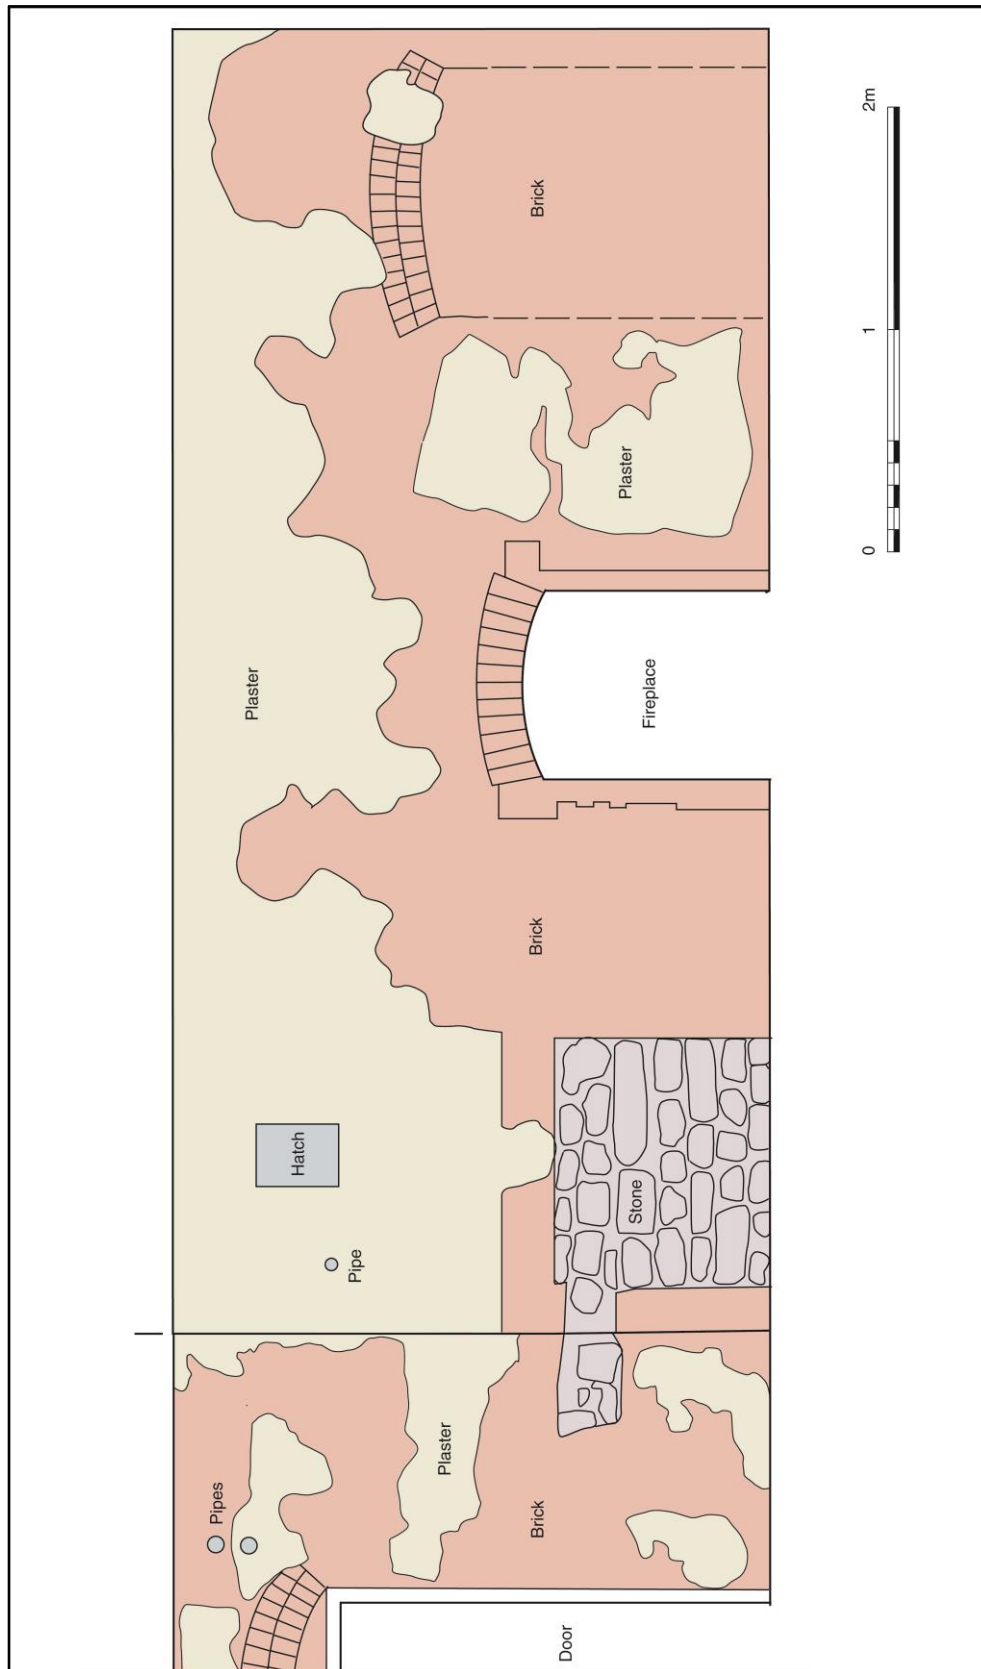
The short west and long north walls of Room B7 showing (opened out) three former fireplaces and, in the west wall the conjoined blocking of a (?) former oven door (Andy Isham).
